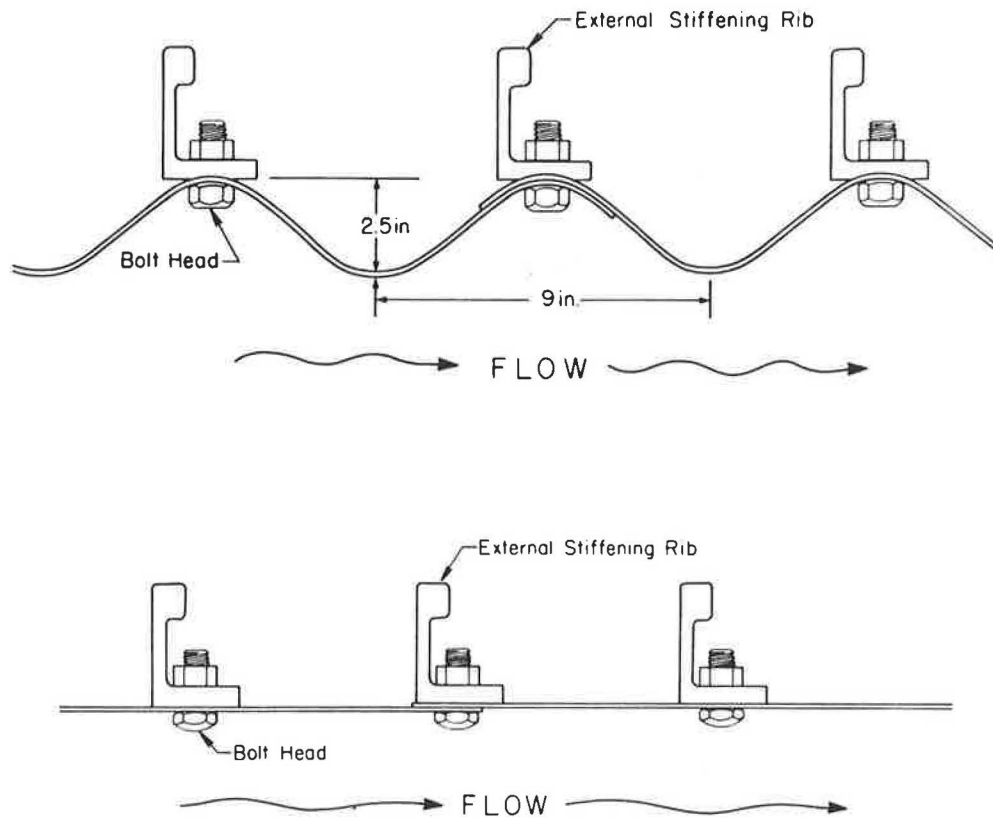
Schematic illustration of corrugated box culvert and smooth-walled box structure wall configurations.
